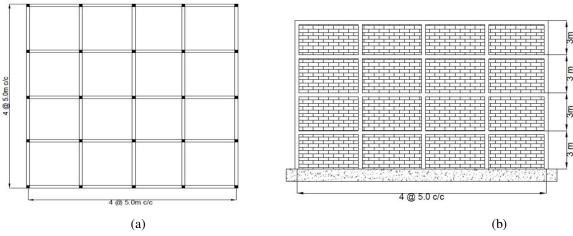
RC frame considered in present study (a) Plan (b) Elevation
